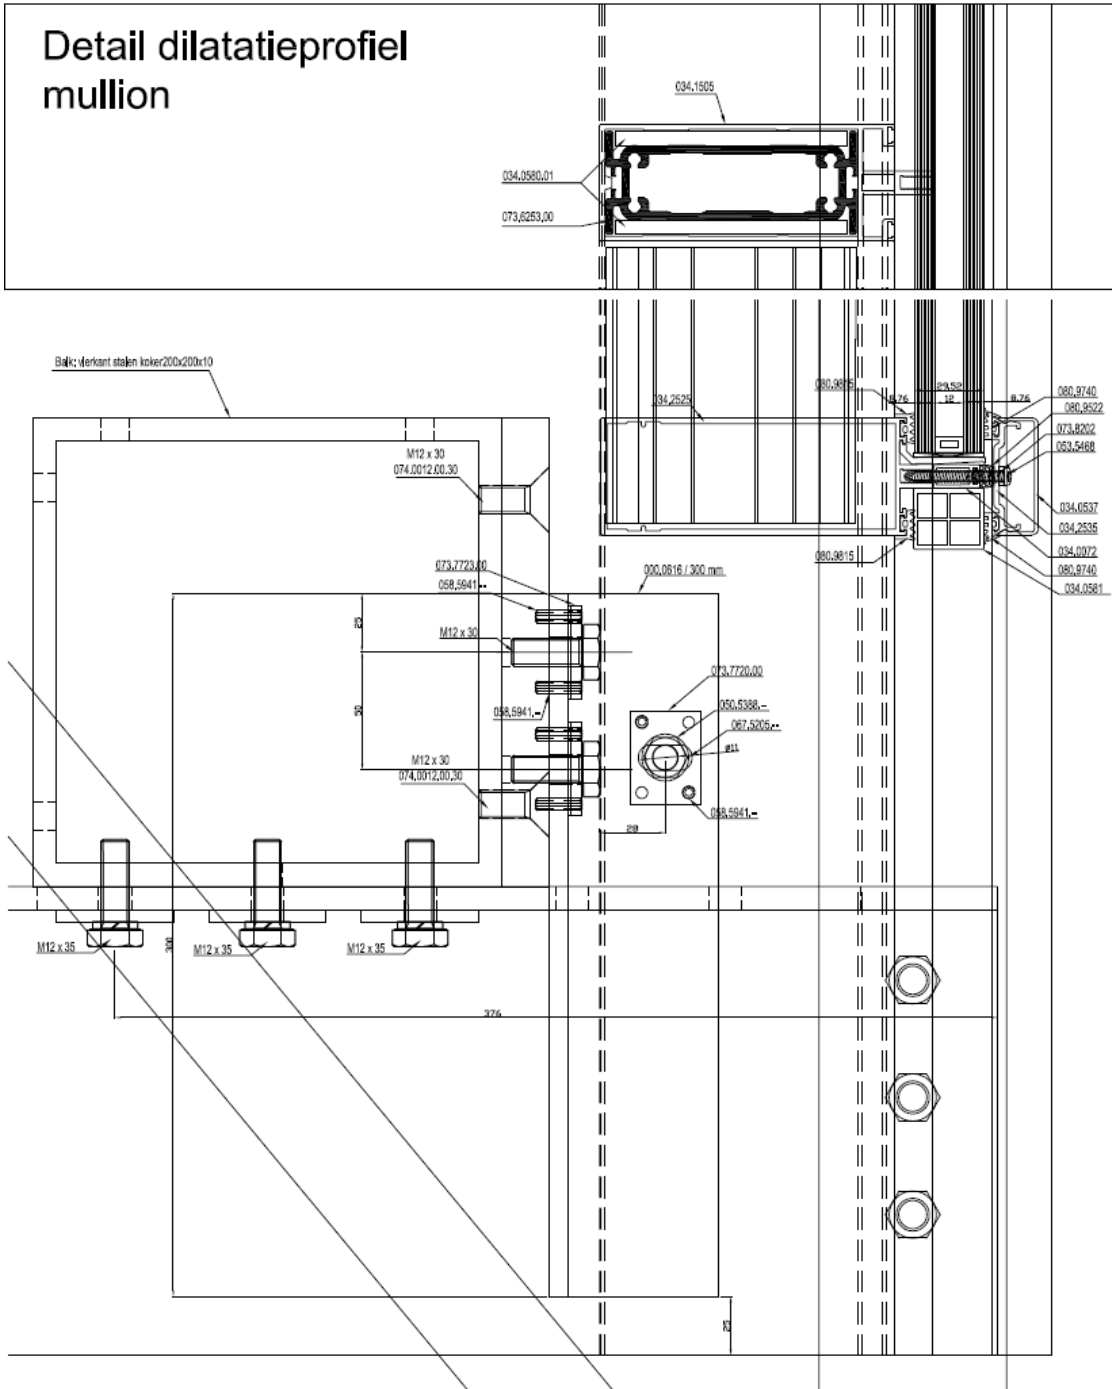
bottom anchorage to the steel structure (fixed anchor) with dilatation joint
